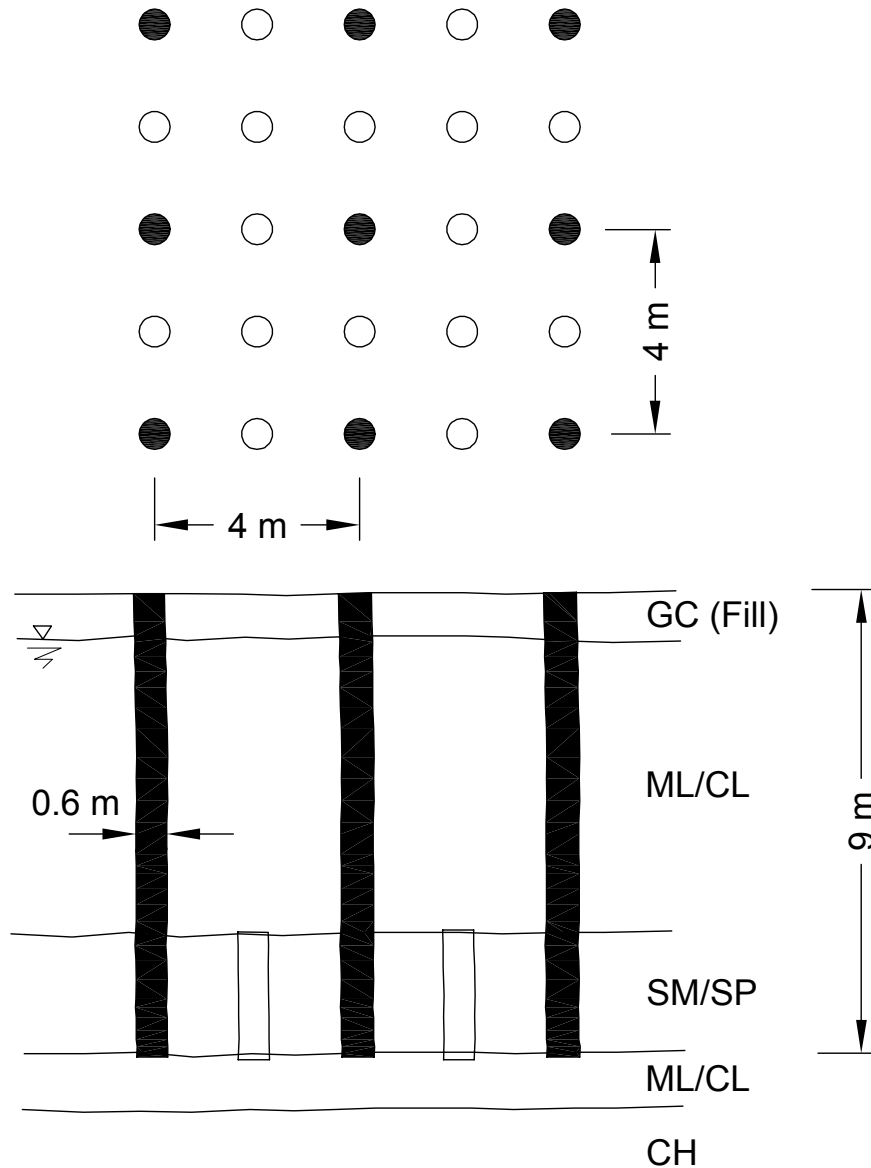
Layout of jet-grout columns used for blanket treatment beneath Shopping Center building at Carrefour site. Additional columns were used at footing locations to provide additional bearing support. Average replacement ratio beneath building was about 7% in the SM layer and 2% in overlying strata.
